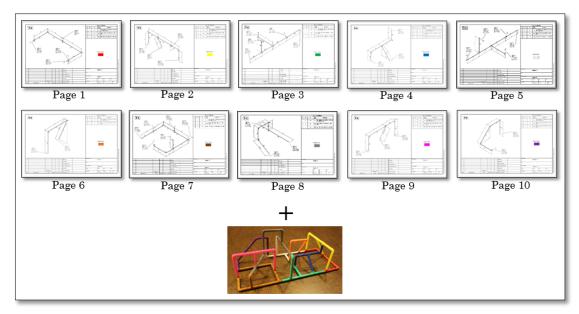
2D Isometric Drawings plus a 3D Physical Model of the Assembly.
